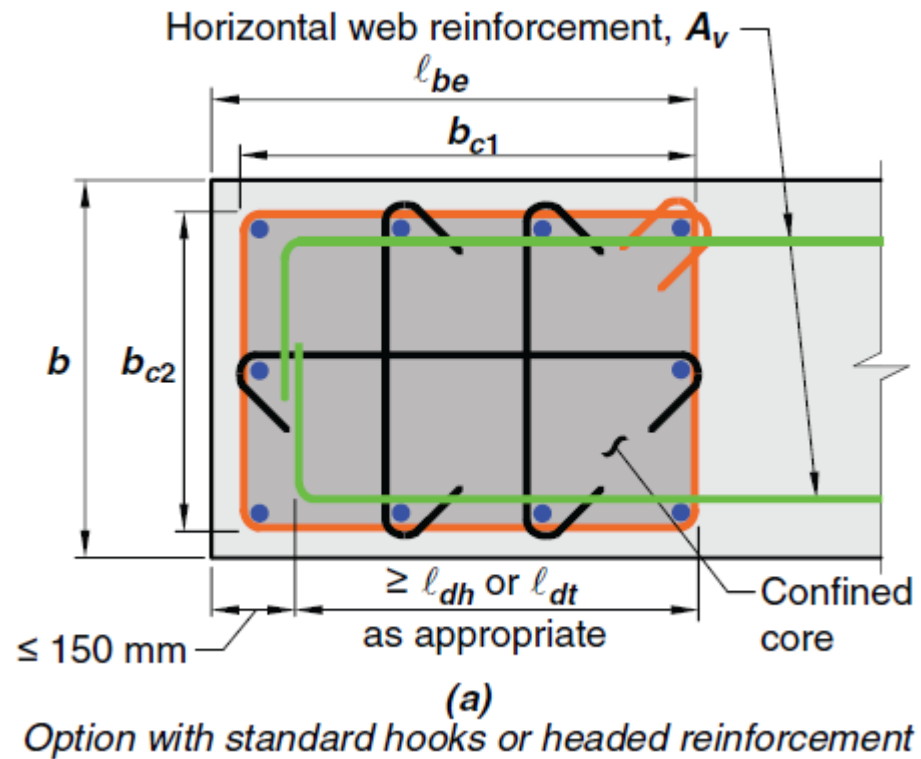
Development of wall horizontal reinforcement in confined boundary element.
